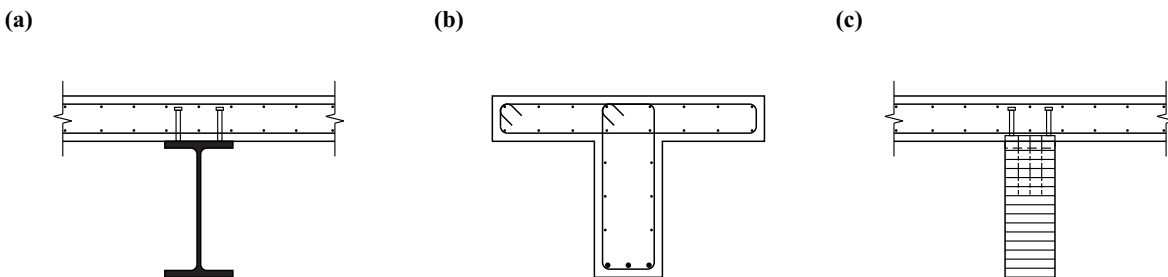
Composite cross-sections: (a) steel-concrete composite construction, (b) reinforced concrete T-beam, (c) timber-concrete composite construction
